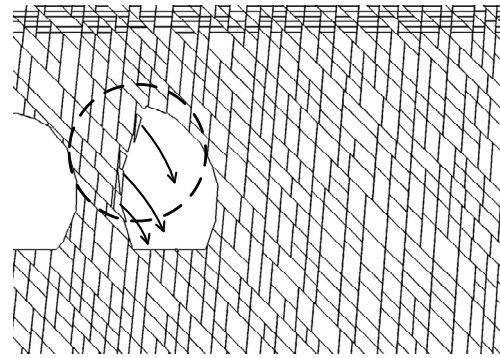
Failure mechanism governed by joint sets at the pillar when excavating the adjacent tunnel (the first tunnel is supported by internal pressure, and the second (drift) tunnel on the right is unsupported)
